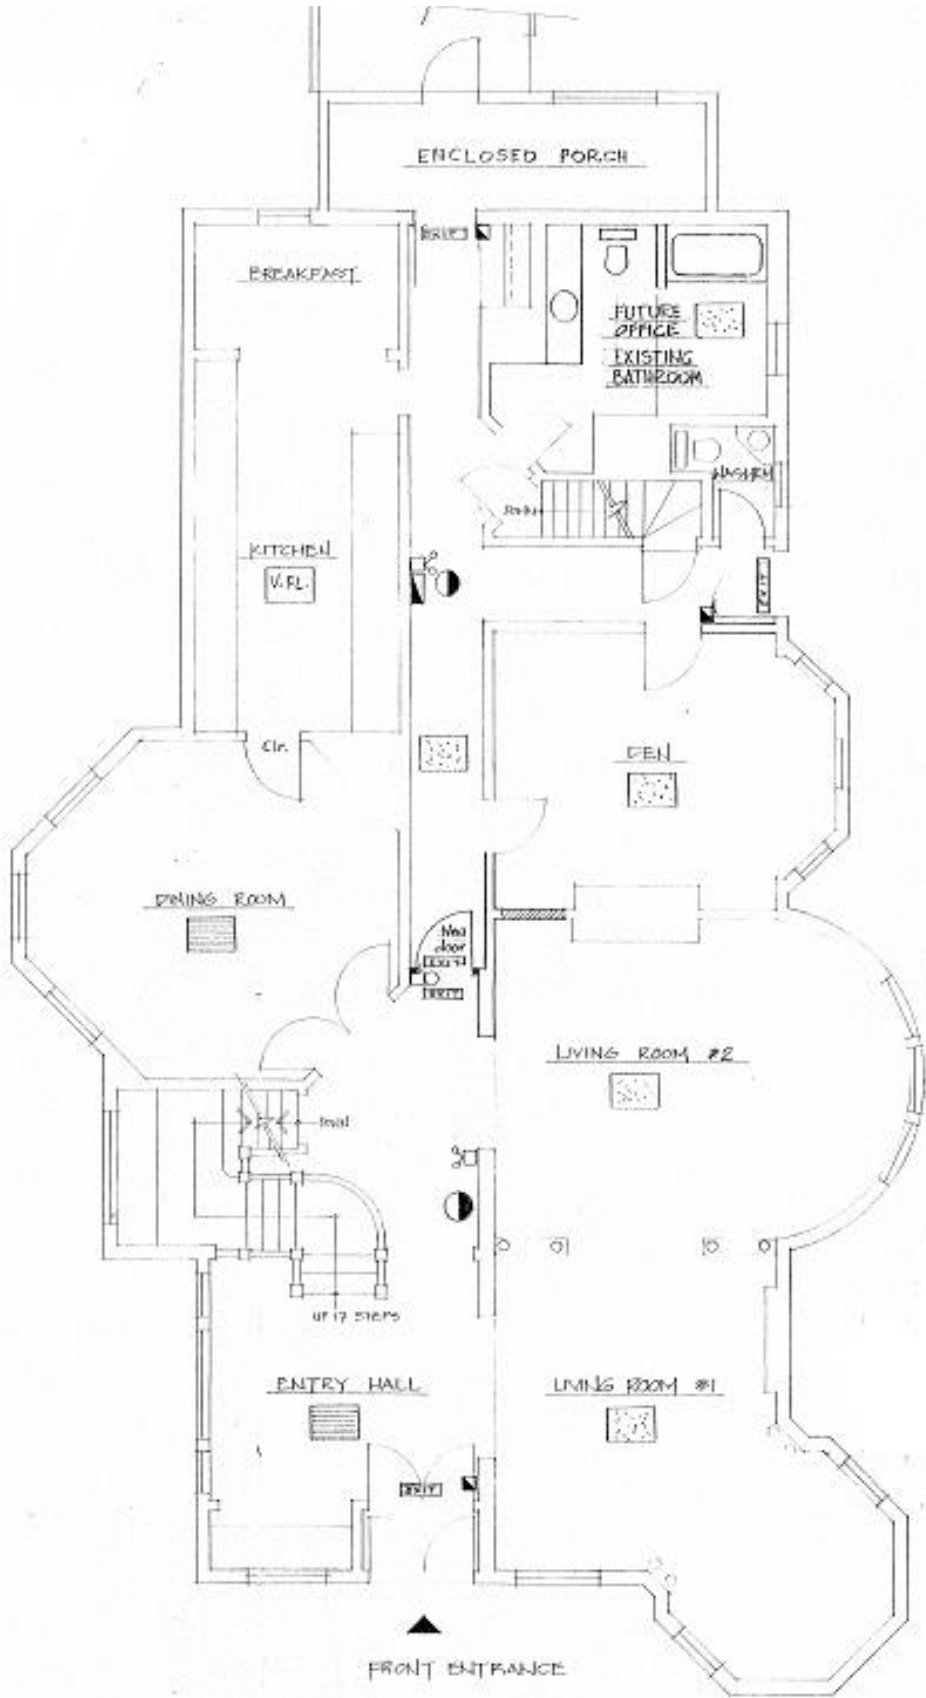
95 King St. W., Gananogue, ground floor plan (Inglis and Downey architects, 1997).
